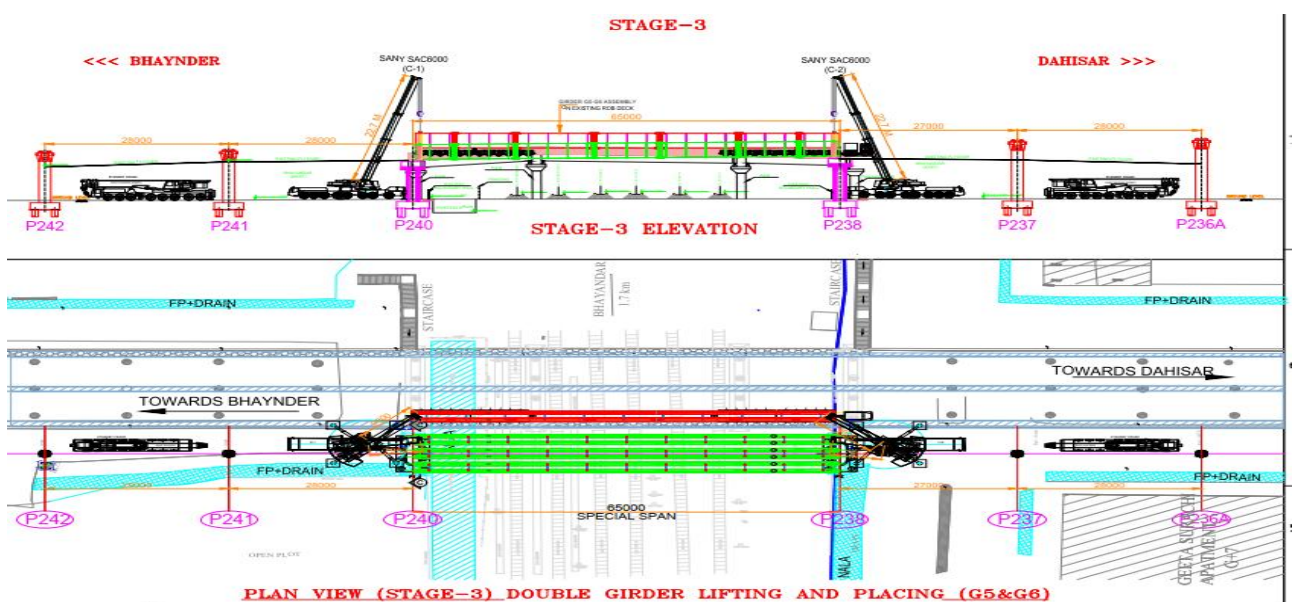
lifting Plan for Stage-III Steel Girder
